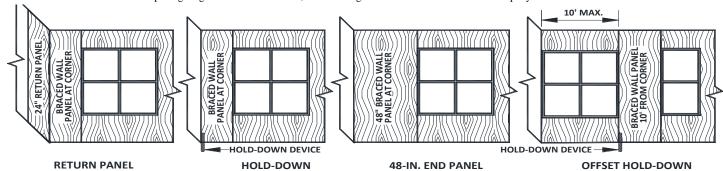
CONTINUOUS-SHEATHING CORNERS IRC BRACED WALL LENGTHS
